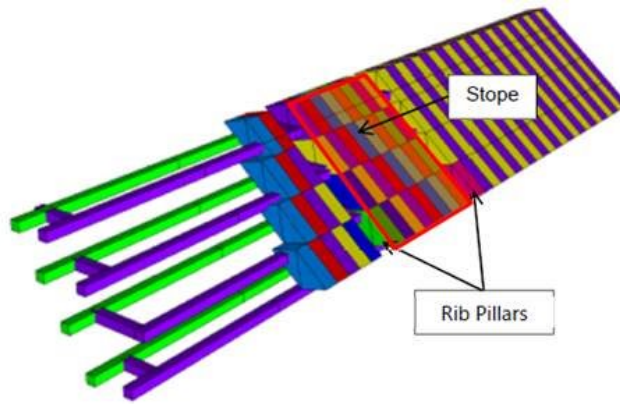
Example of Modelled Mining Configuration for Longitudinal Open Stoping
